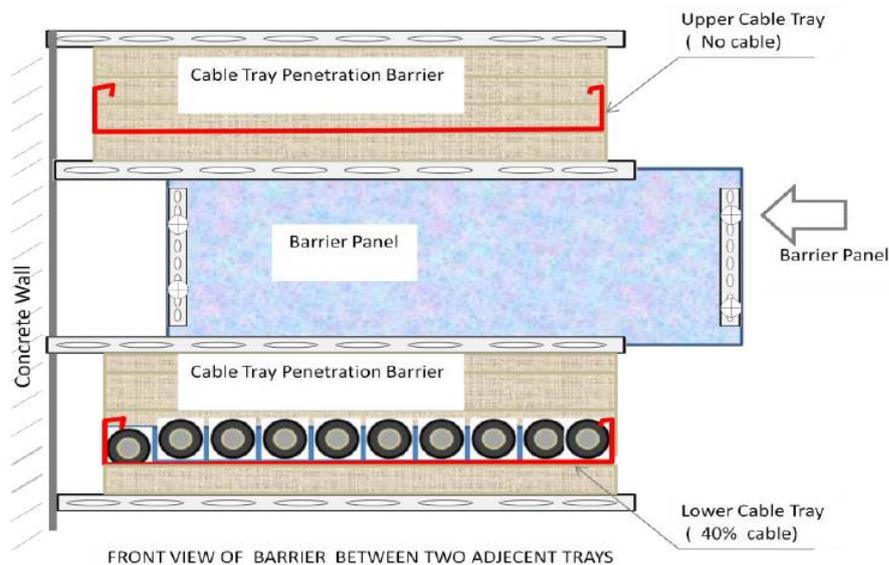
Fire barrier arrangement in a typical cable tunnel
